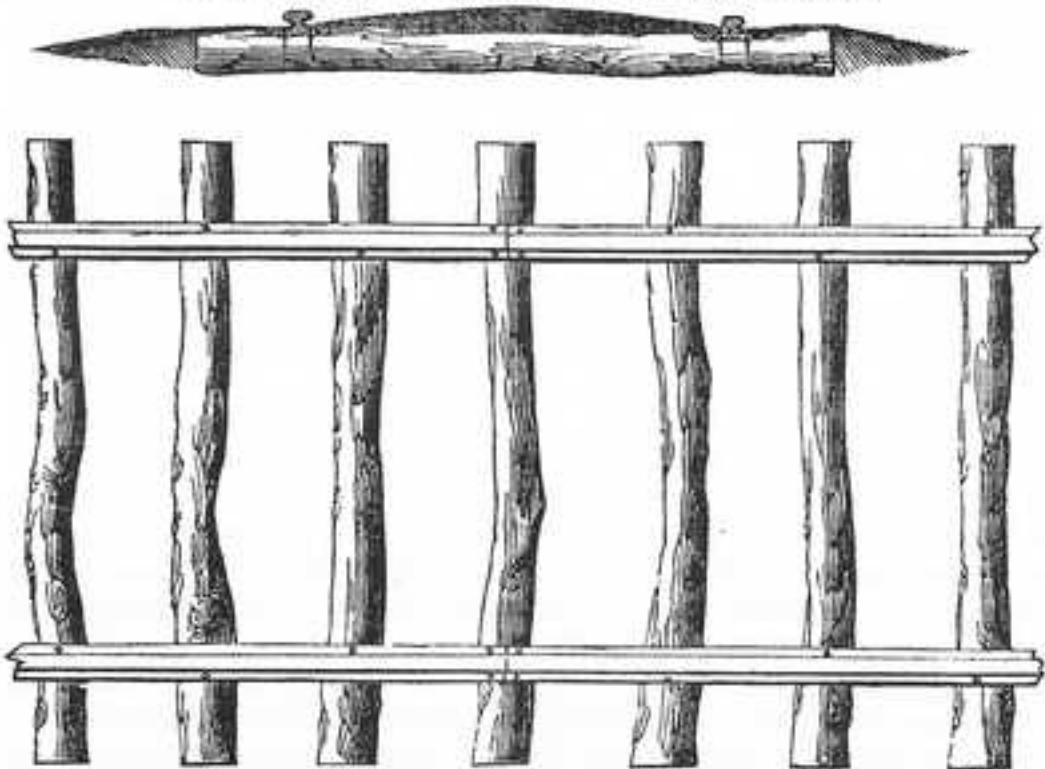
PLAN OF RAILWAY—(Scale, 4 feet to 1 inch.)
